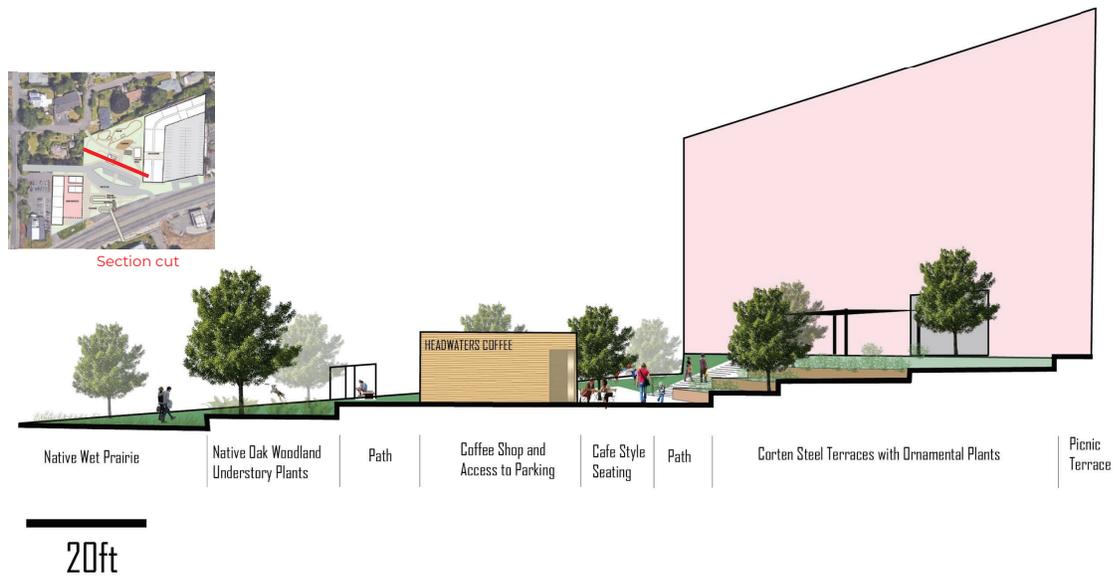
Section of the terraced garden café area and the future mixed-use residential building on the right.
